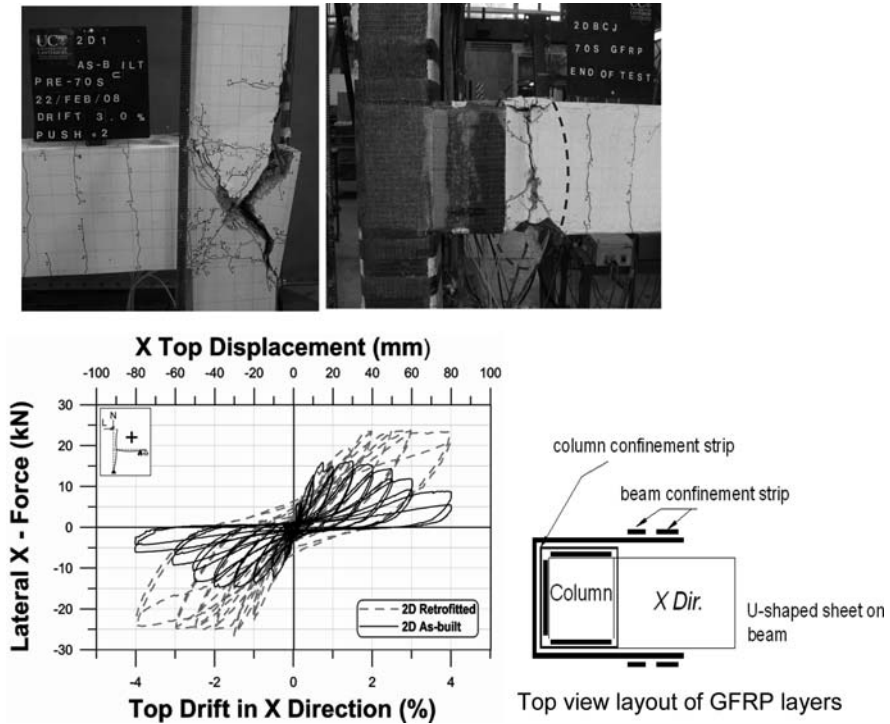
Retrofit of exterior beam-column joint using fiber reinforced polymers. Protection of the joint panel zone and inversion of the hierarchy of strength with plastic hinge in the beam (after [27])
